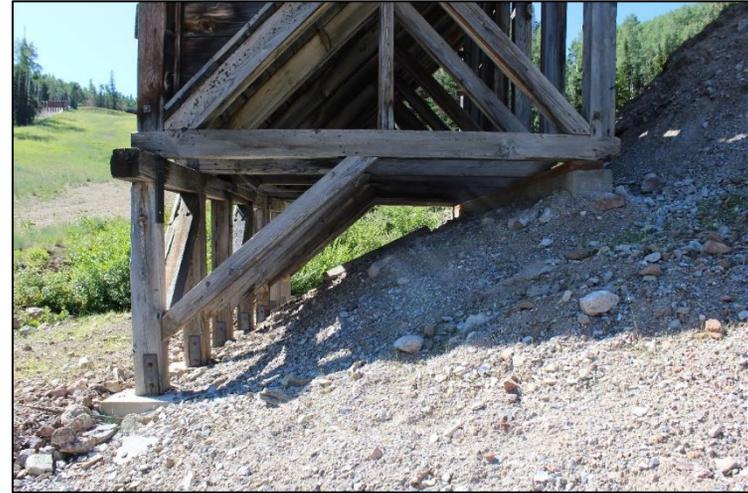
Concrete footings and repaired wood posts supporting Little Bell Mine Ore Bin, facing south.
